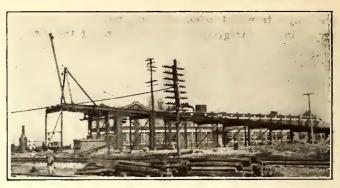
ERECTING THE STEEL ON ONE OF THE VIADUCTS
